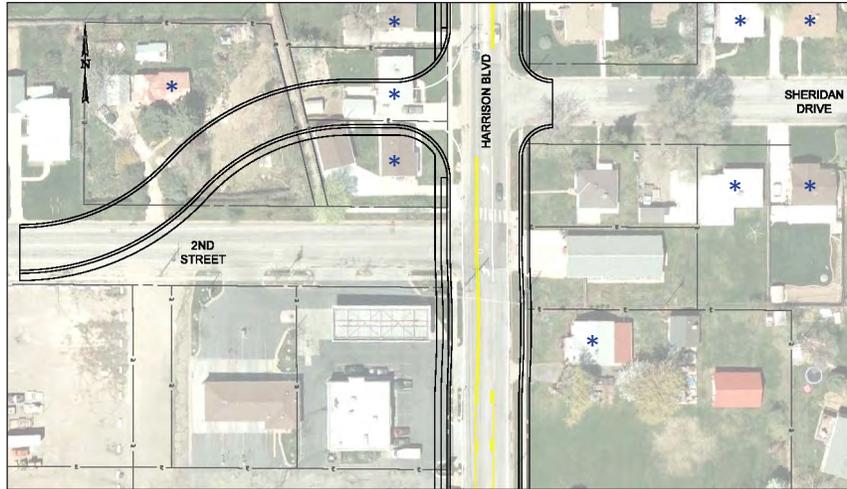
Intersection Alternative 1, align both 2nd Street and Sheridan Drive; *indicates Section 4(f) Property.
